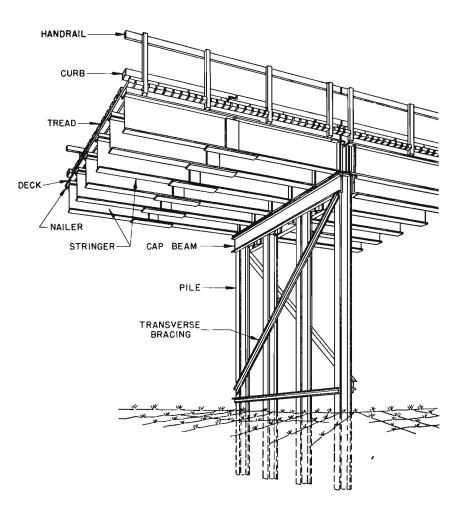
Highway bridge, class 50, double-lane, steel stringers on steel pile bent; class 25 similar except 3 piles in bent.
